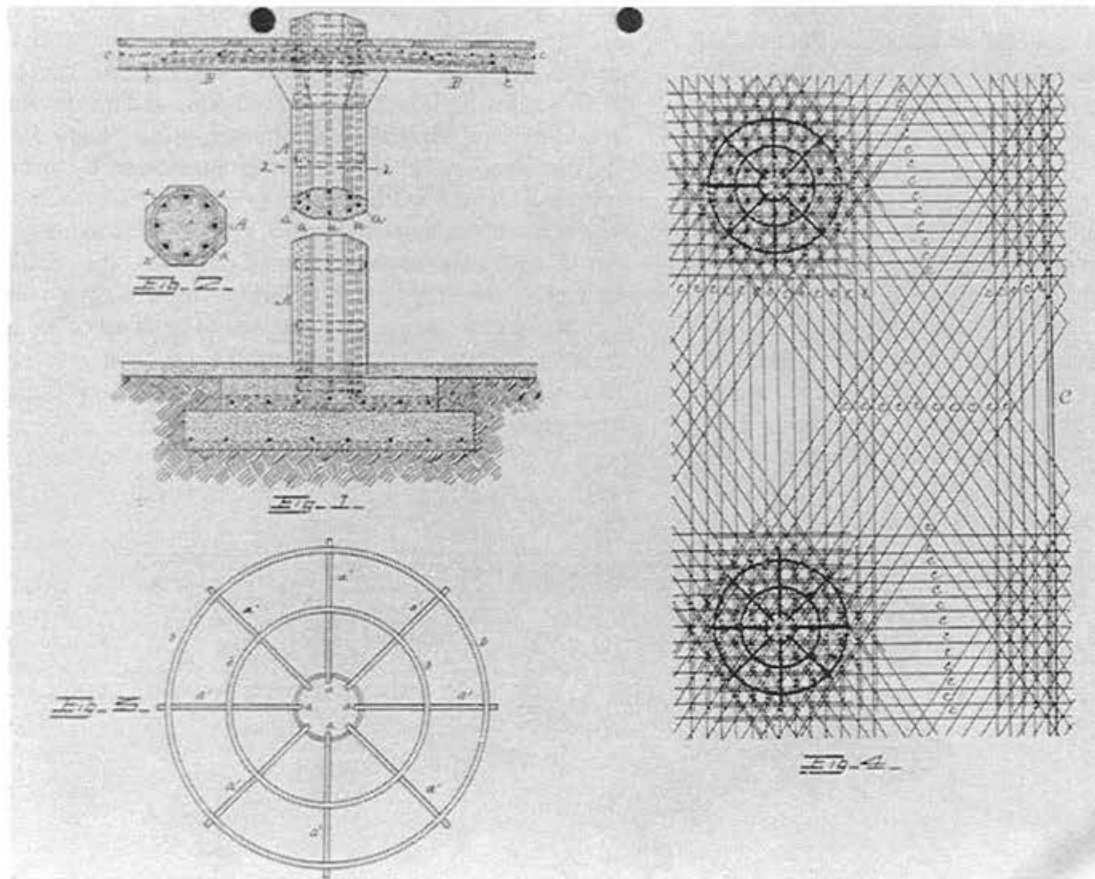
Reinforcement layout from the C.A.P. Turner patent application.
